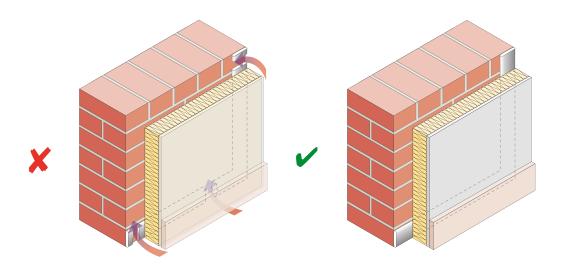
The laminated thermal wall panel – comprised of mineral wool insulation board bonded to tapered edge, vapour-check plasterboard – must be continuously sealed at all perimeter edges against the external wall to eliminate air infiltration between the panel and external wall. This applies to panels fitted directly to external wall with adhesive and/or mechanical fixings.
